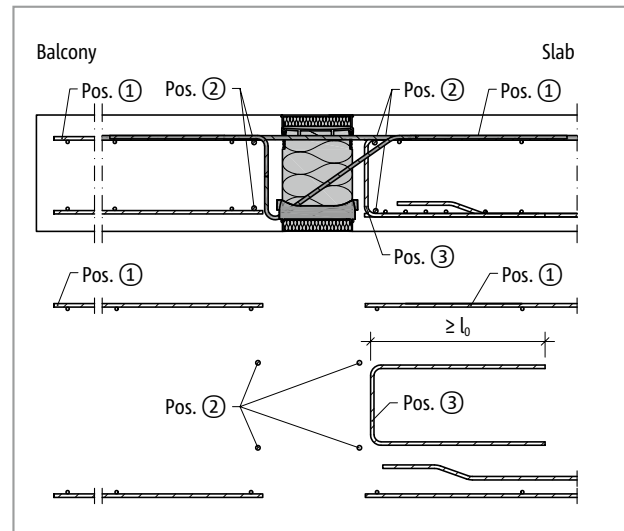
Schöck Isokorb® XT type K-M1 to M10: On-site reinforcement with indirect support
